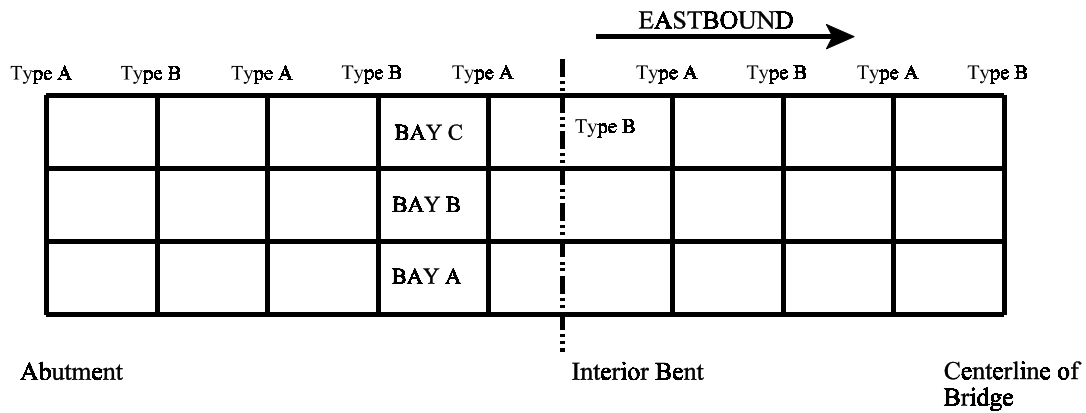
Partial framing plan for Coletto Creek Bridge.
